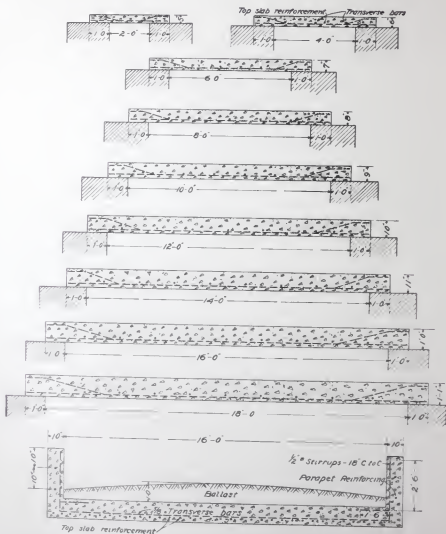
Typical Reinforced Concrete Slabs for Highway Culverts, Office of State Highway Commission, Richmond, Va.
